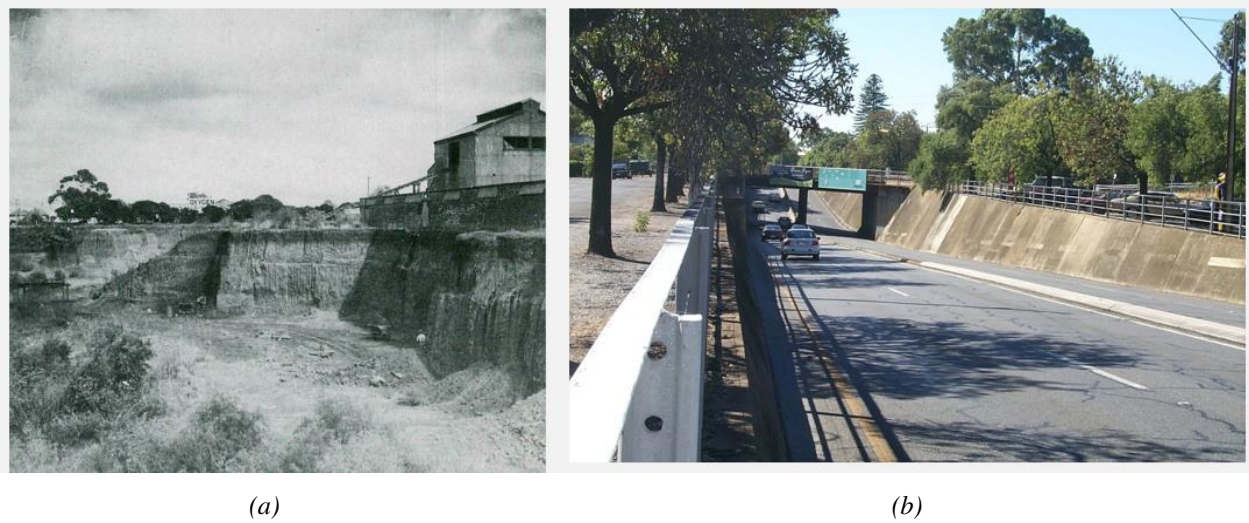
(a) The Hallett Brick Company clay quarry, (b) Underpass at Millswood, Adelaide.
